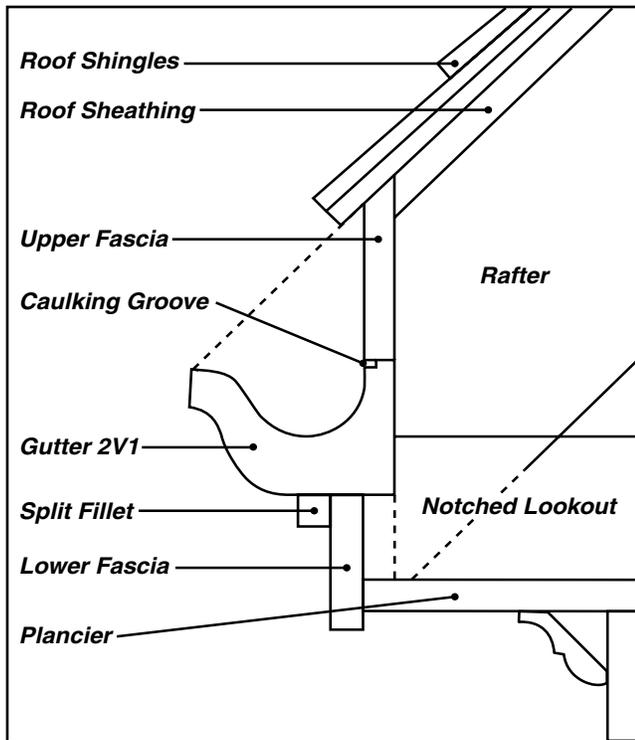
Section Through Eaves Showing Boston Pattern Milled Wood Gutter
